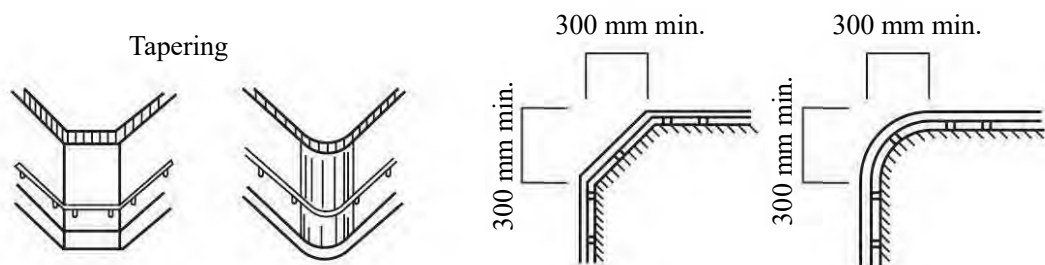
Tapering/rounding of corner walls (guide)
